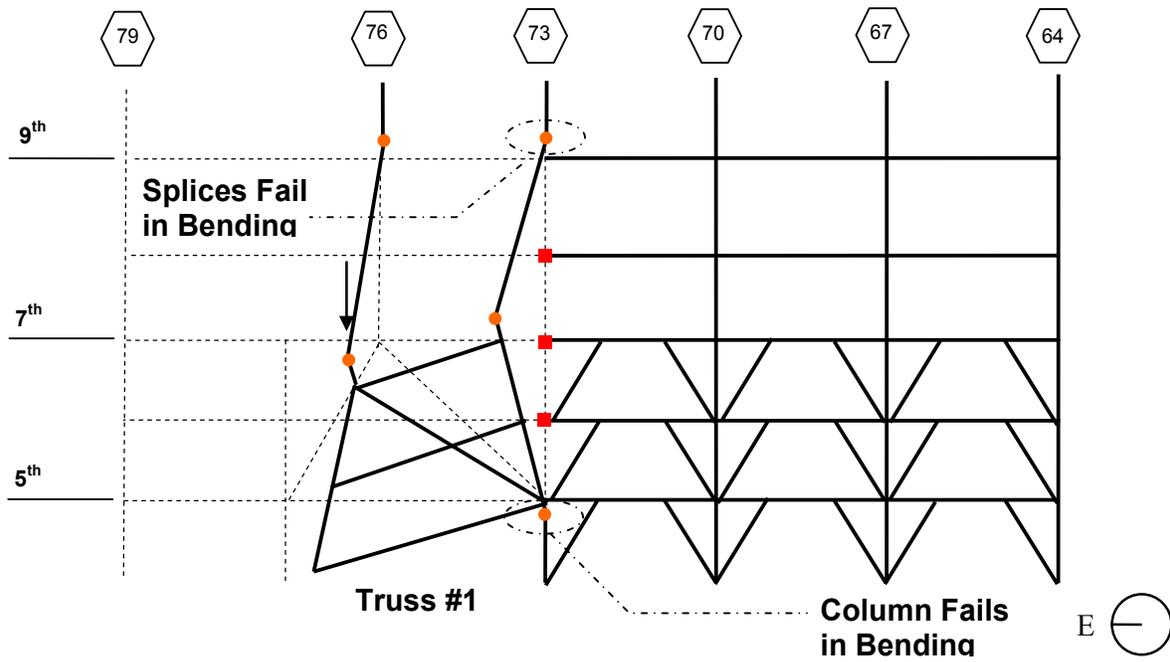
Horizontal progression mechanism for truss #1 failure.
